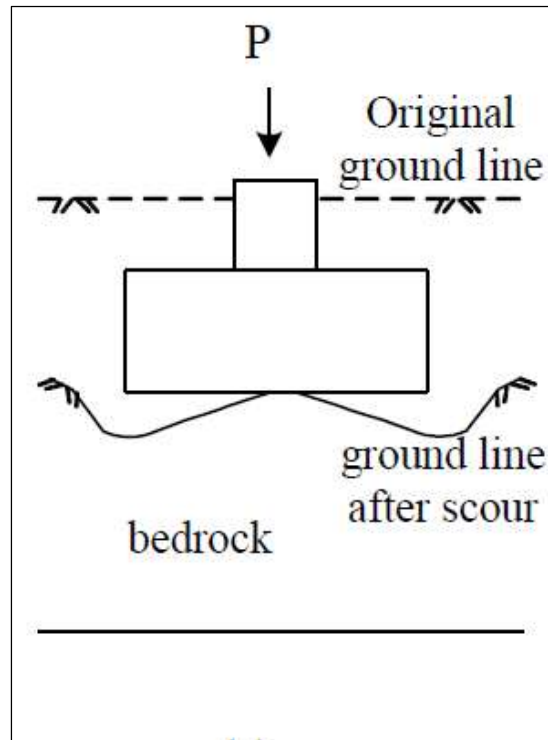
Undermining of footing base (After Lin et al.2010)
